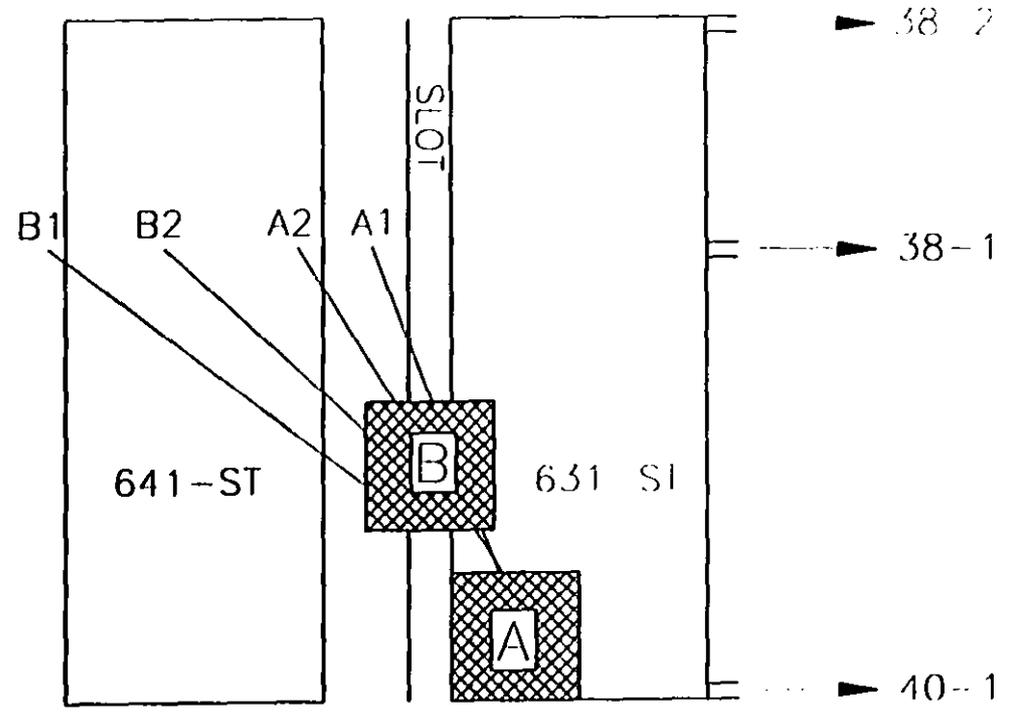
38-1 Level Plan Showing Instrument Locations
